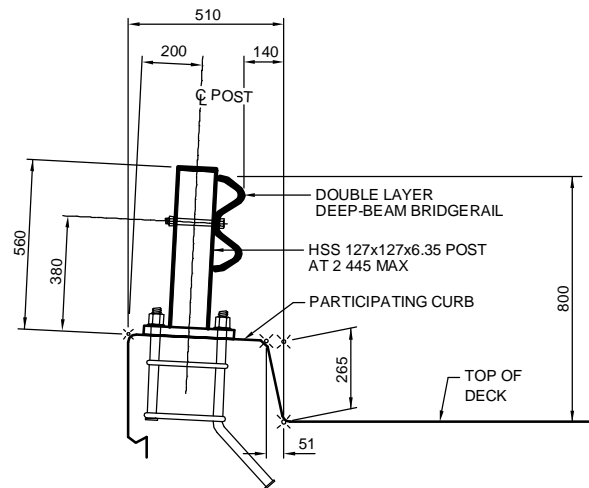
(DETAILS SHOWN BASED ON DRAWING S-675-69)
